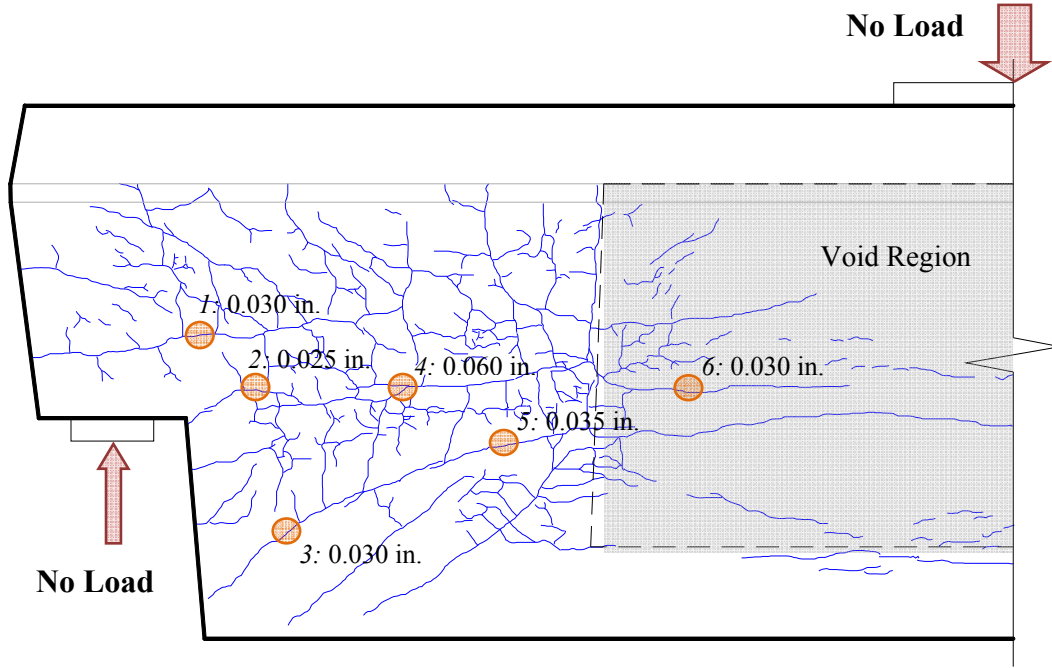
Pre-test cracking and crack widths due to ASR and DEF on the west side of the tested shear span of beam RF-3R-9(c).
